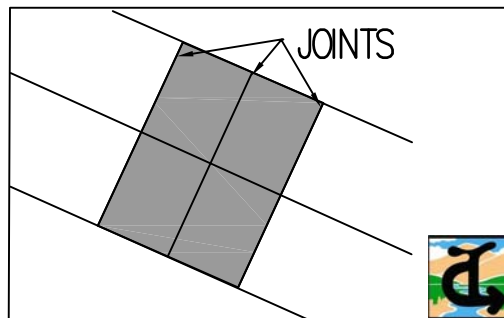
Example 4: In concrete pavements, remove sections to existing joints.
